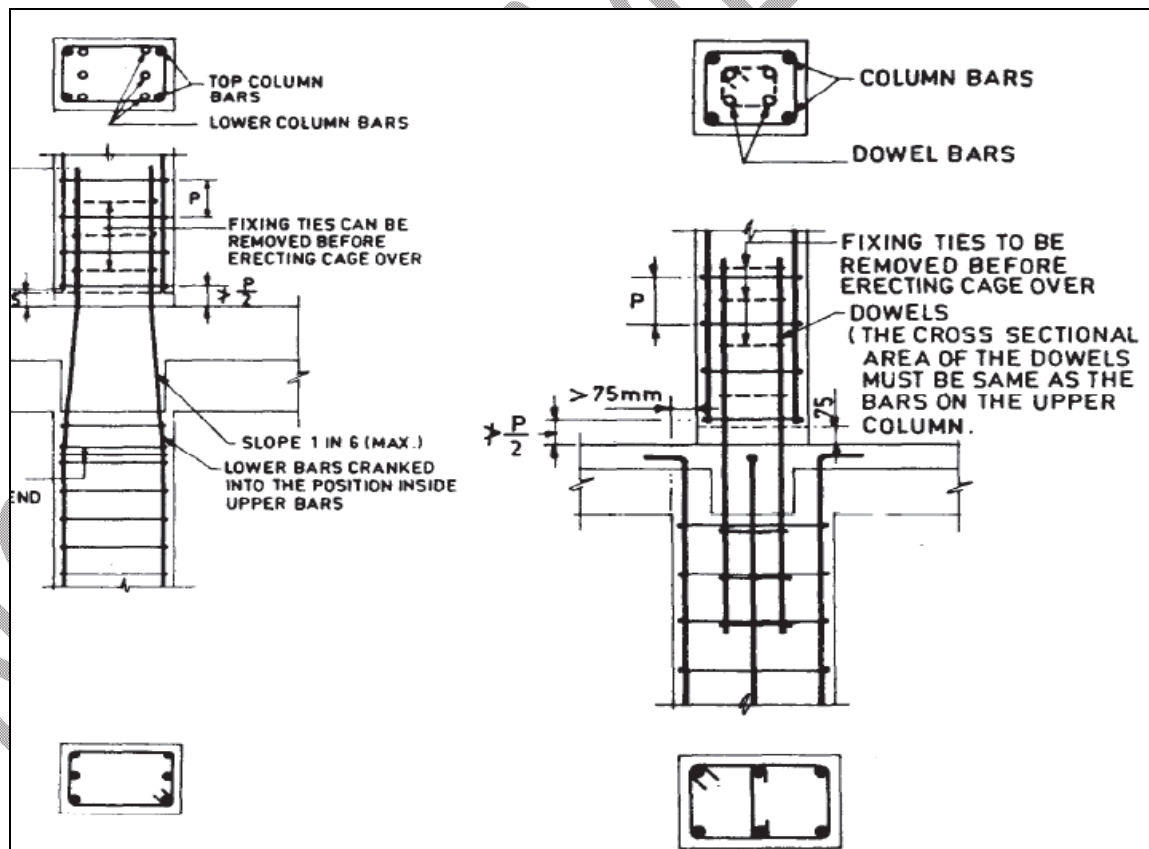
Typical detailing of column continuation junction as described in SP 34
